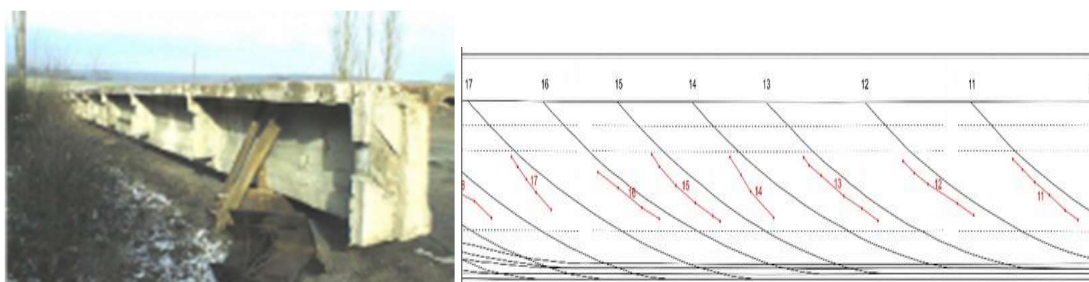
Photo of the studied beam and scheme of the prestressing cables position on one side of the beam
